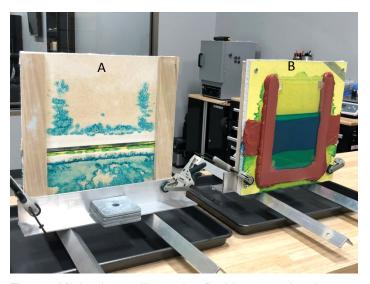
Mini-columns illustrating flashing-associated wetting at column walls and treated joint. A. Back face of test specimen; B. Front face of test specimen.
